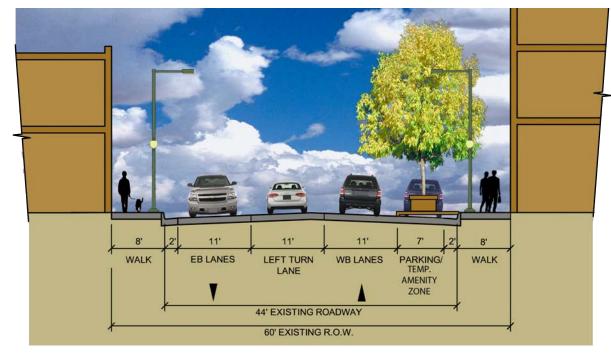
Main Street Retrofit Road Diet Cross Section. This section illustrates the short-term road diet option within the typical 60-foot right-of-way. The street is restriped to a 3-lane section with on-street parking on one side, most likely on the south side of the street. Portions of the parking lane could have a temporary amenity zone with planters, seating, and other amenities.
